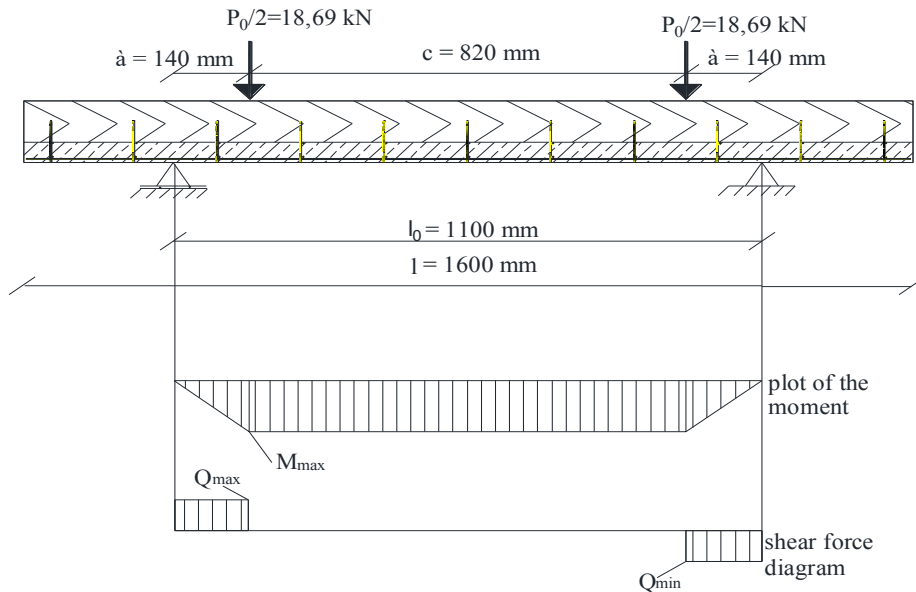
Design scheme of a wood-rubcon reinforced composite bridge beam.
